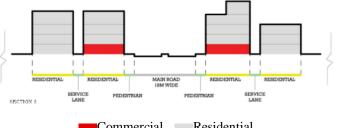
Road sections through the residential block, across inner park spaces [7]
